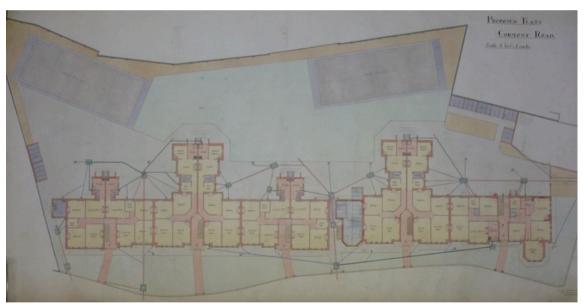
Floor plan of 'Calais Gate', a large block of flats on Cormont Road. The drawings are signed by the Minet Estate Office, 54 Knatchbull Road, and built in 1903-04 by the Cooperative Builders, who had their yard in Brief Street (Ibid., IV/83/3/1/14).
